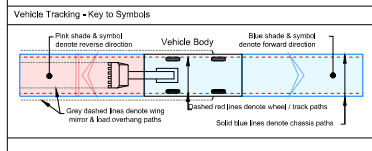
MMD-01-XX-DR-C-DRAFT
